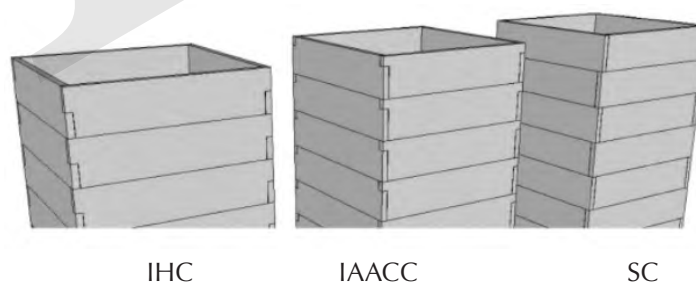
Types of corner connections for precast concrete walls (K.V. Tolsma³⁰, 2010).
